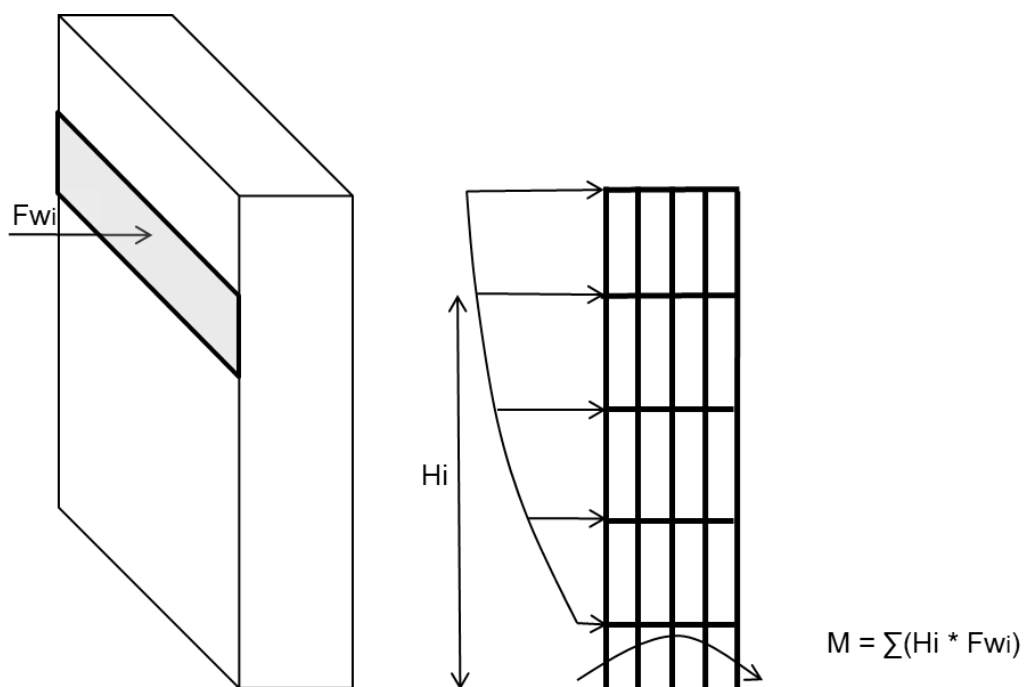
The wind load and vertical axial forces of columns at the ground floor with or without the shear lag phenomenon.
